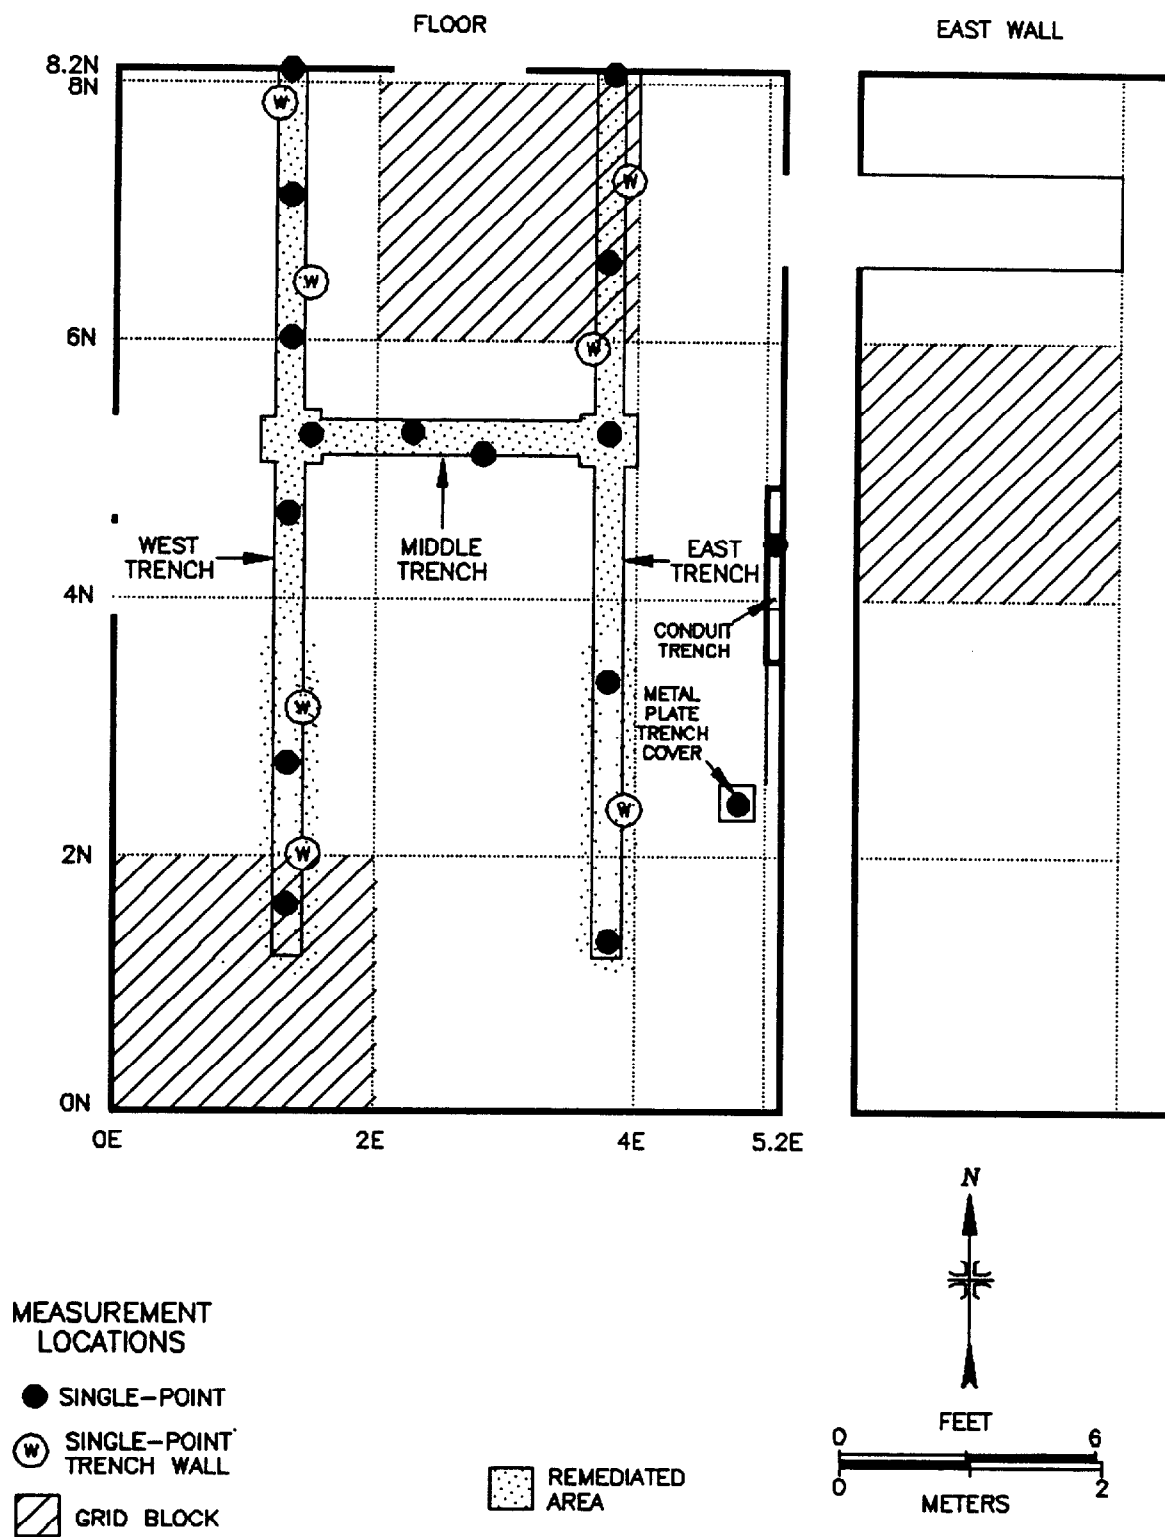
Building 24, Room 103, Floor and East Wall – Remediated Areas and Measurement Locations
